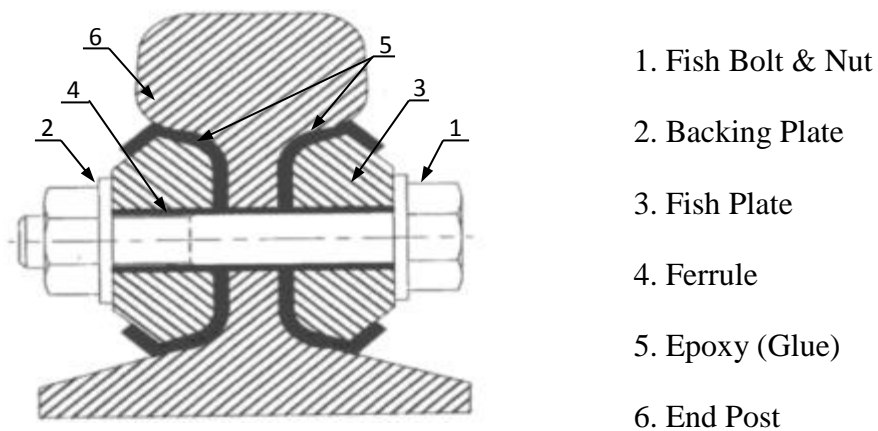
12- Cross-Section of an Insulated Joint [21, 22].
